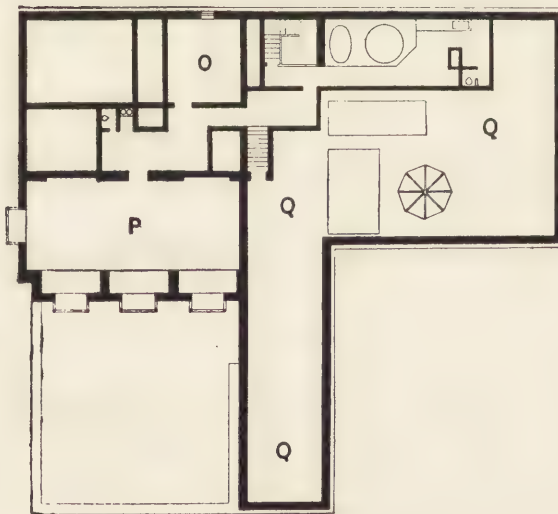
A HOUSE IN CAIRO: TOP-FLOOR PLAN.
